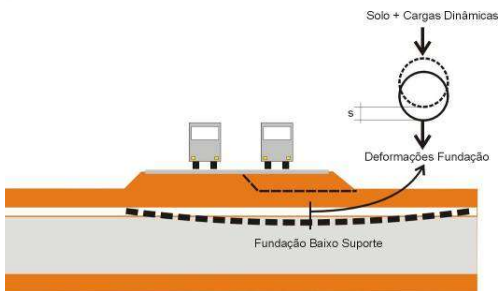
ROAD EMBANKMENT ADVANCING OVER UNPROTECTED PIPELINE ON LOW CAPACITY FOUNDATION.
